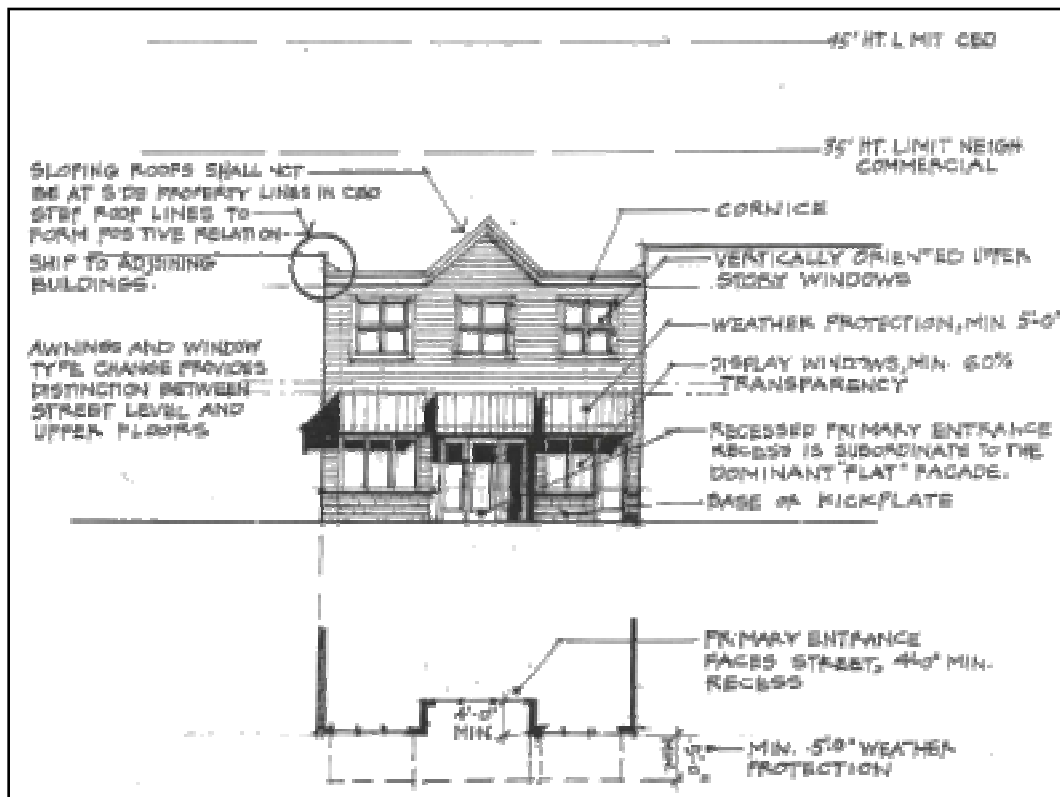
Acceptable Building Elements (Typical 2-story) in the CBD
